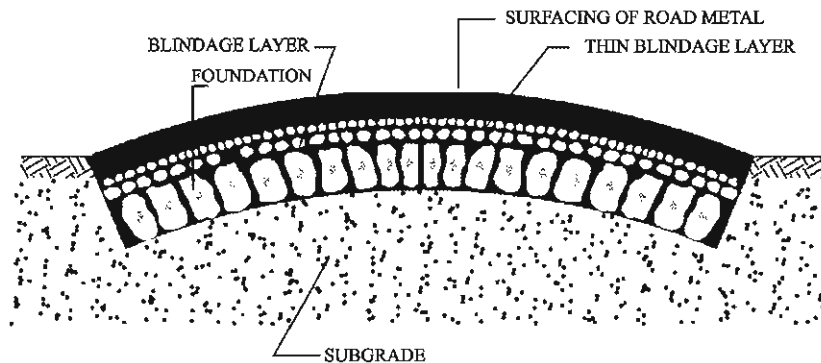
CONSTRUCTION OF WATERBOUND MACADAM ROAD
